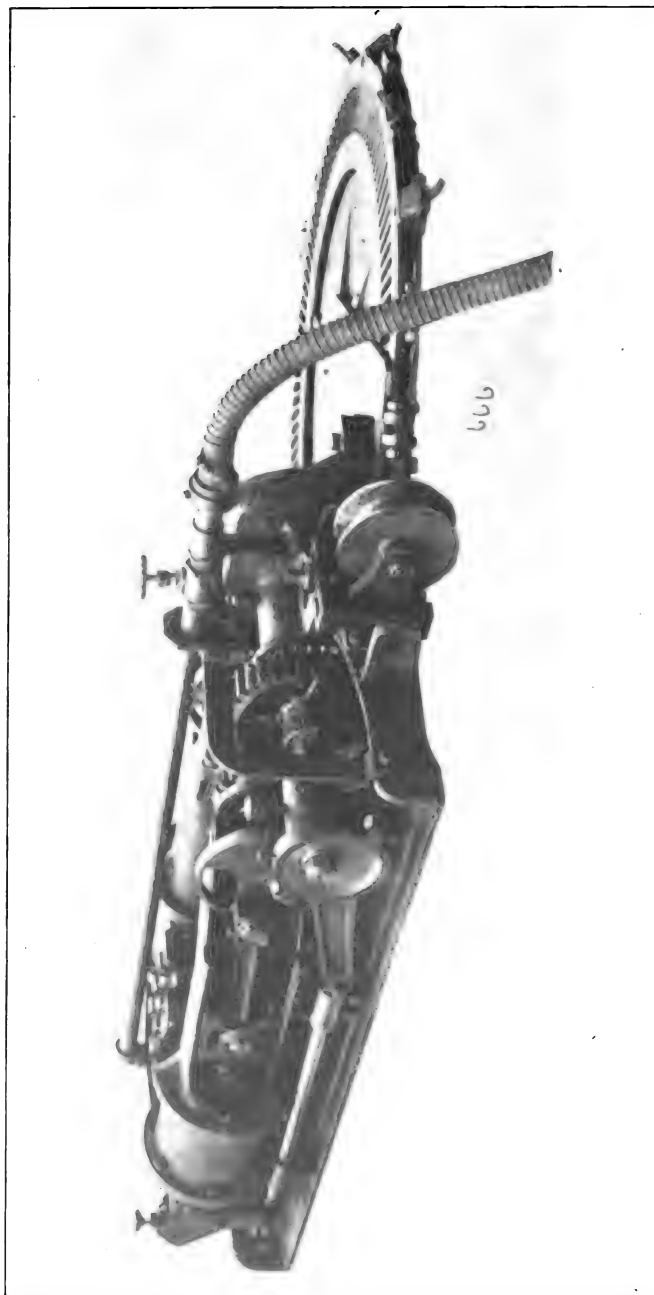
Jeffrey Disc Coal Cutter, Style 22—C.
